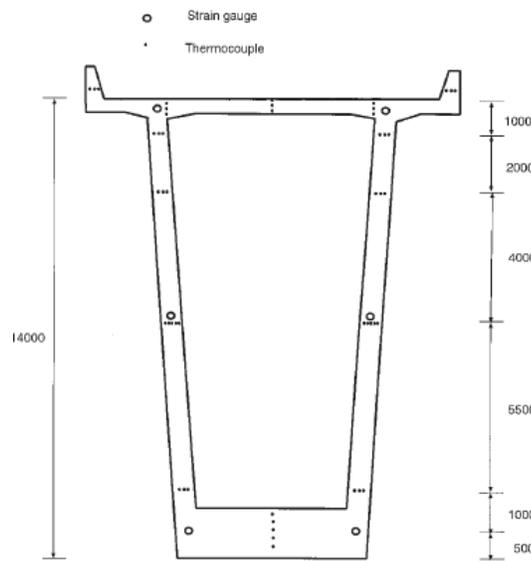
Thermocouple and Strain Gauge Placement in Concrete Box Girder
